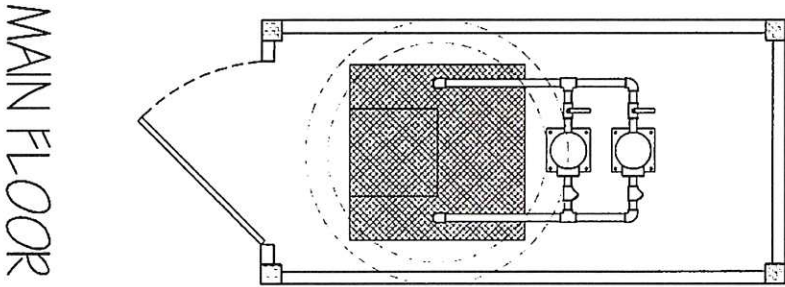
Exhibit B-Site Plan Details EXISTING SUBTERRANEAN
